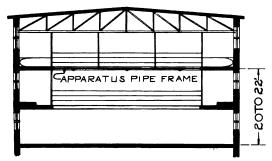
Apparatus Pipe Beams for Irregular or Sloping Overhead Construction. There should be no slope or "pitch" to gymnasium ceiling girders. If this type of construction cannot be avoided, auxiliary beams for suspended apparatus, are imperative. This requirement applies also to sloping or irregular ceilings from which there are no projecting girders.
